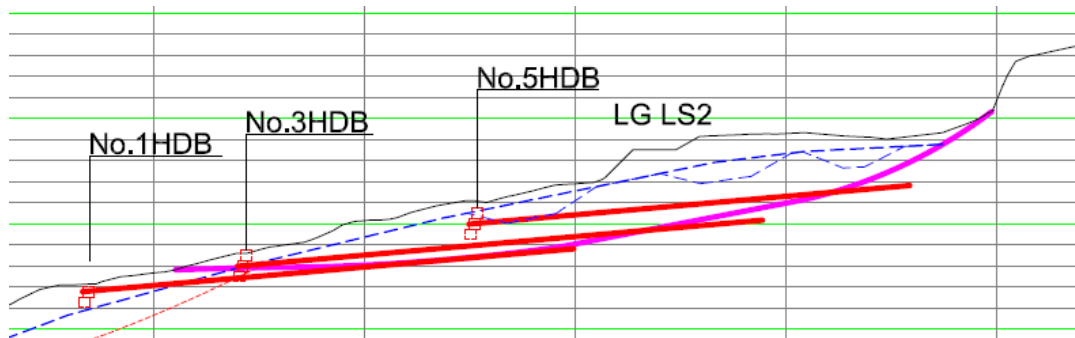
L-section shown the Countermeasure B-B (La Guillen LS-2 block)
